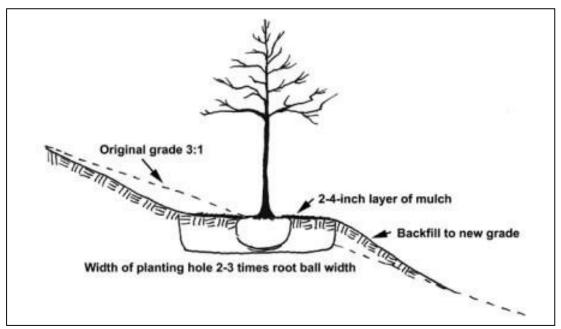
Trees planted on steep slopes require a constructed level planting surface.
